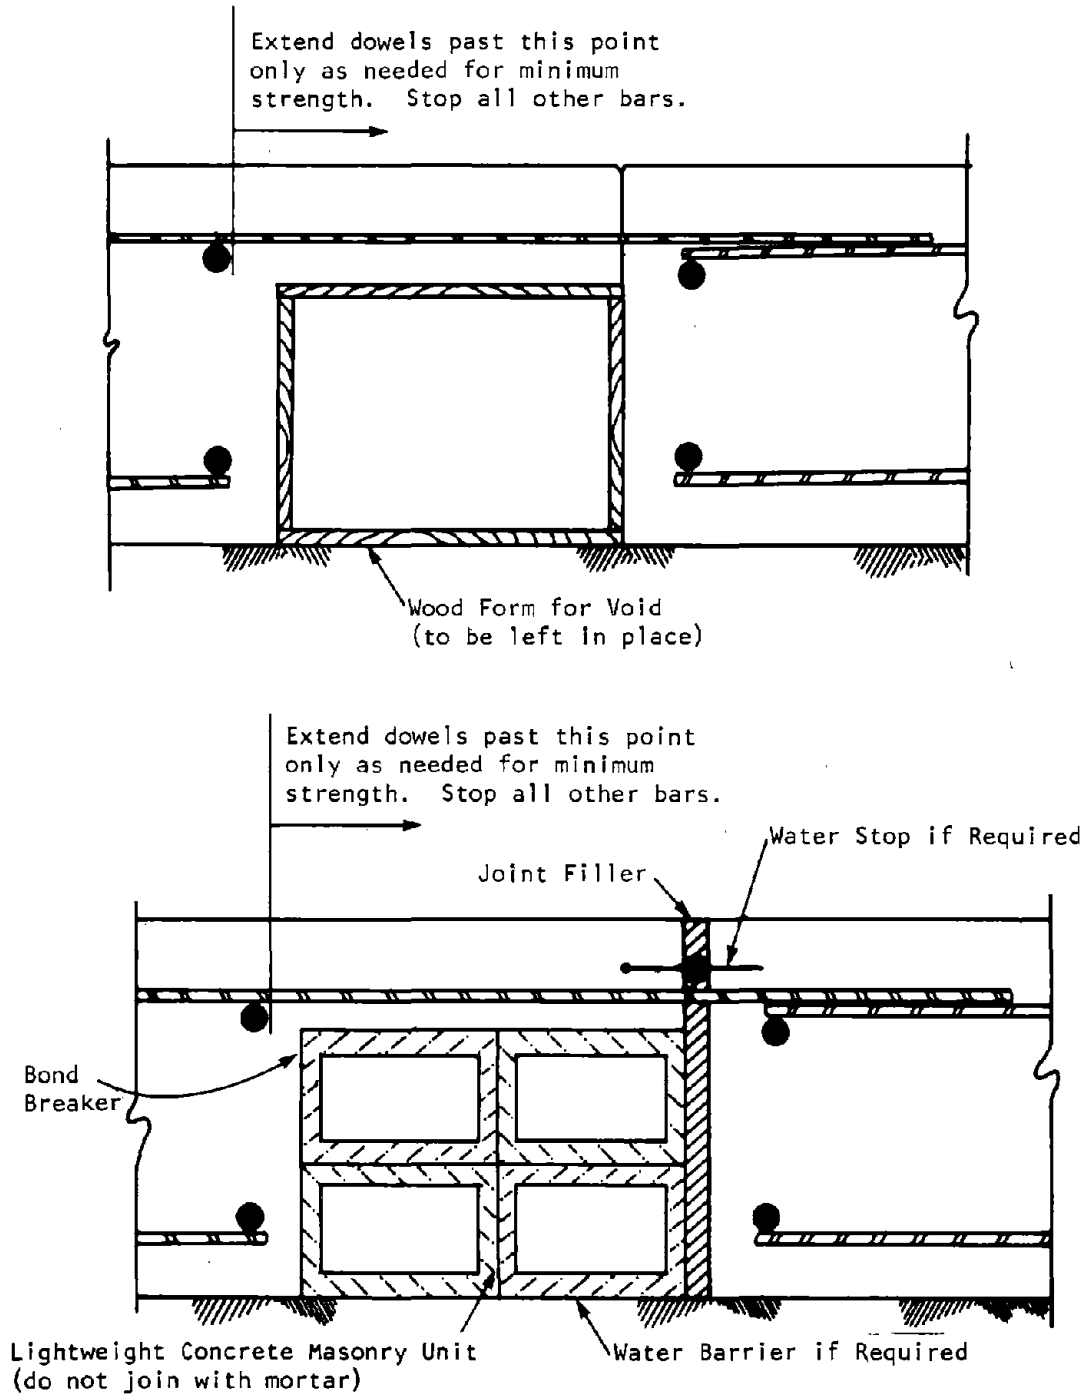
Proposed seismic joint for reinforced concrete conduit.
